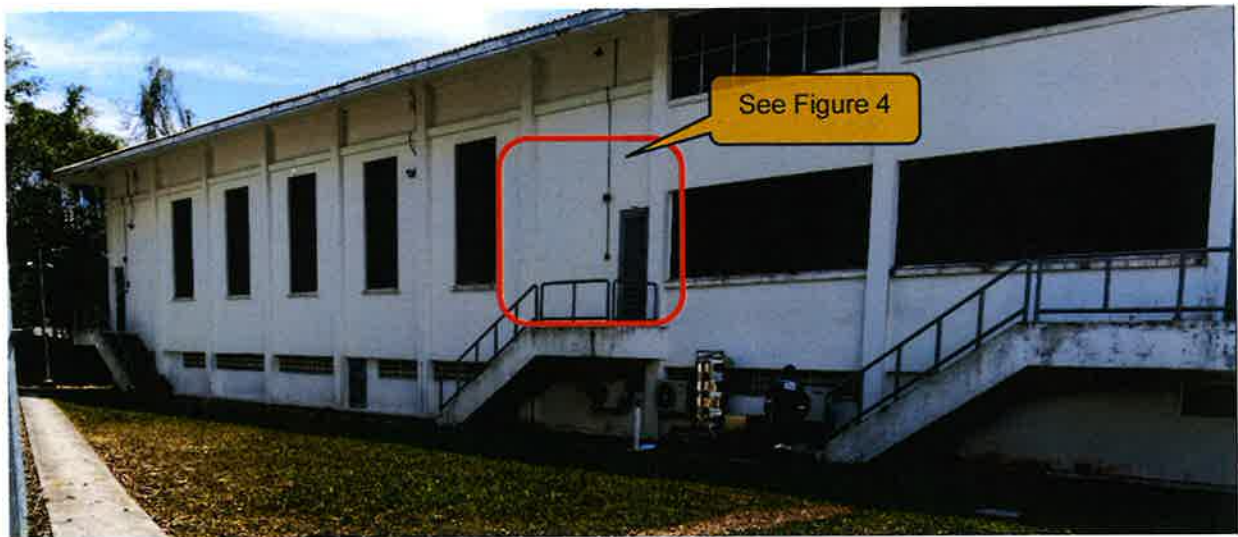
Proposed conversion from single leaf to double leaf steel louvre door
